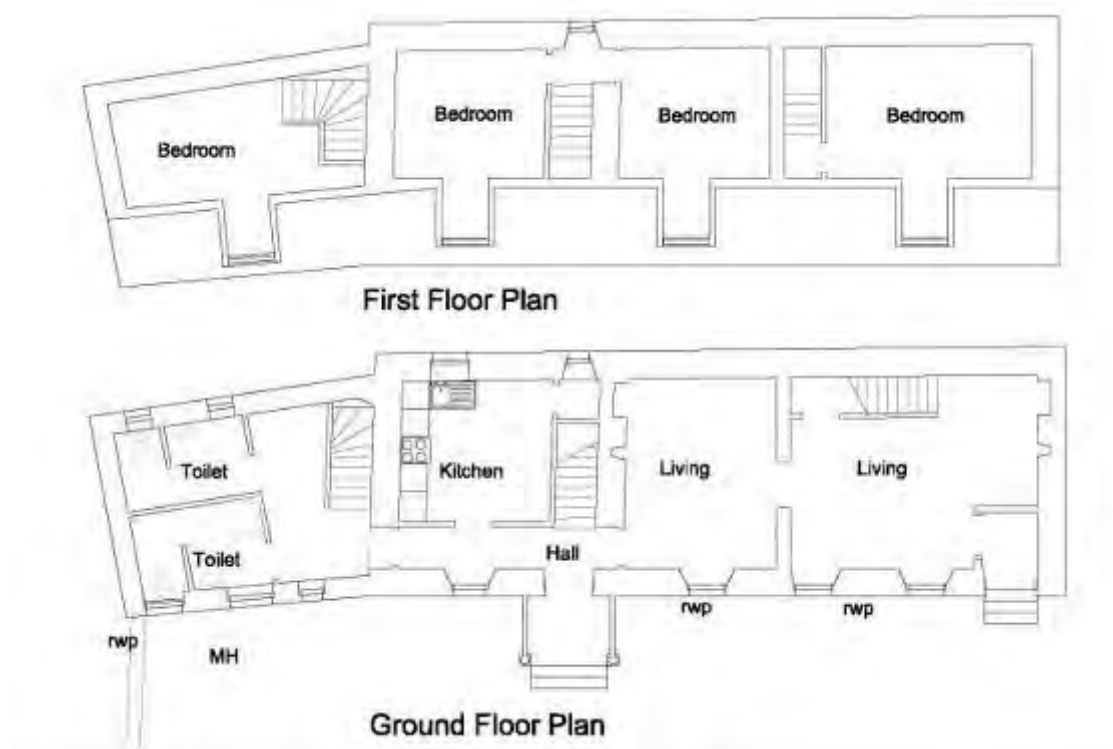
Plan of Garden Cottage ground and first floor 2009 UoS
